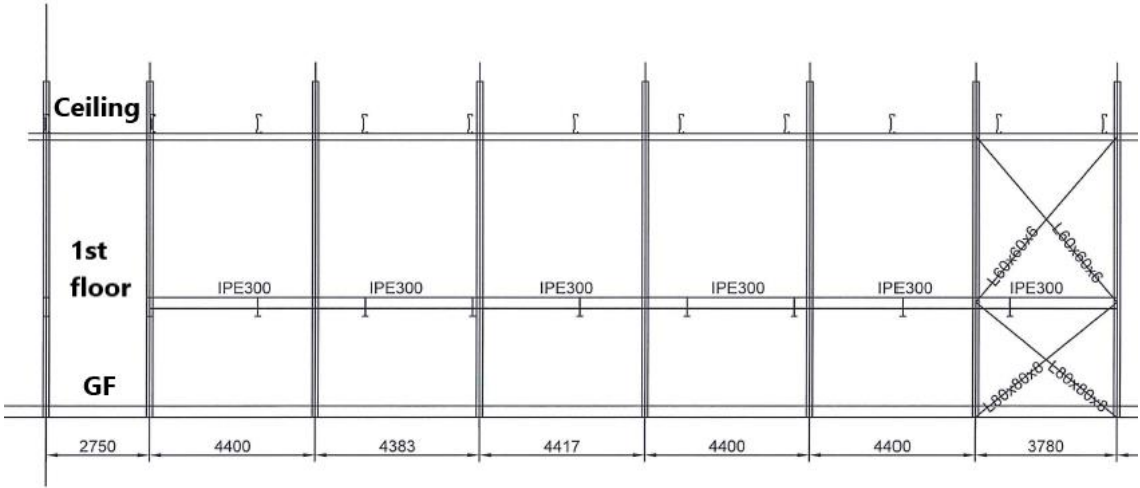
Inside layout of the existing building (dimensions in mm)
